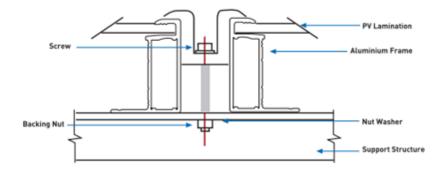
PV MODULES INSTALLED USING MIDDLE CLAMPING METHOD 6.1.3. BIFACIAL MODULE INSTALLATION AND MOUNTING
